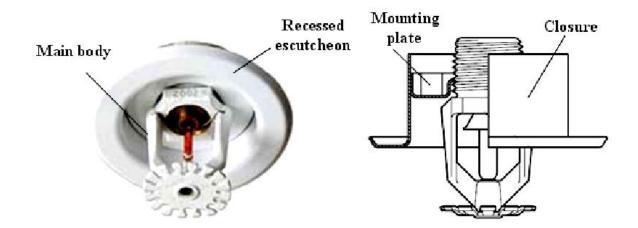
Typical recessed pendent sprinkler (Taken from Tyco Fire & Building Products 2014)
